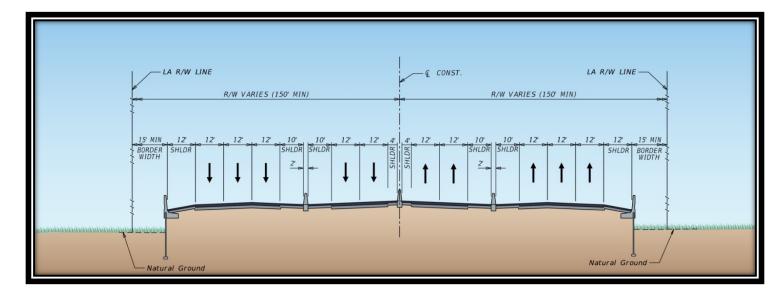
Proposed Typical Section (6 GUL +4 EL without rail envelope) – SR 528 to W. of SR 435
